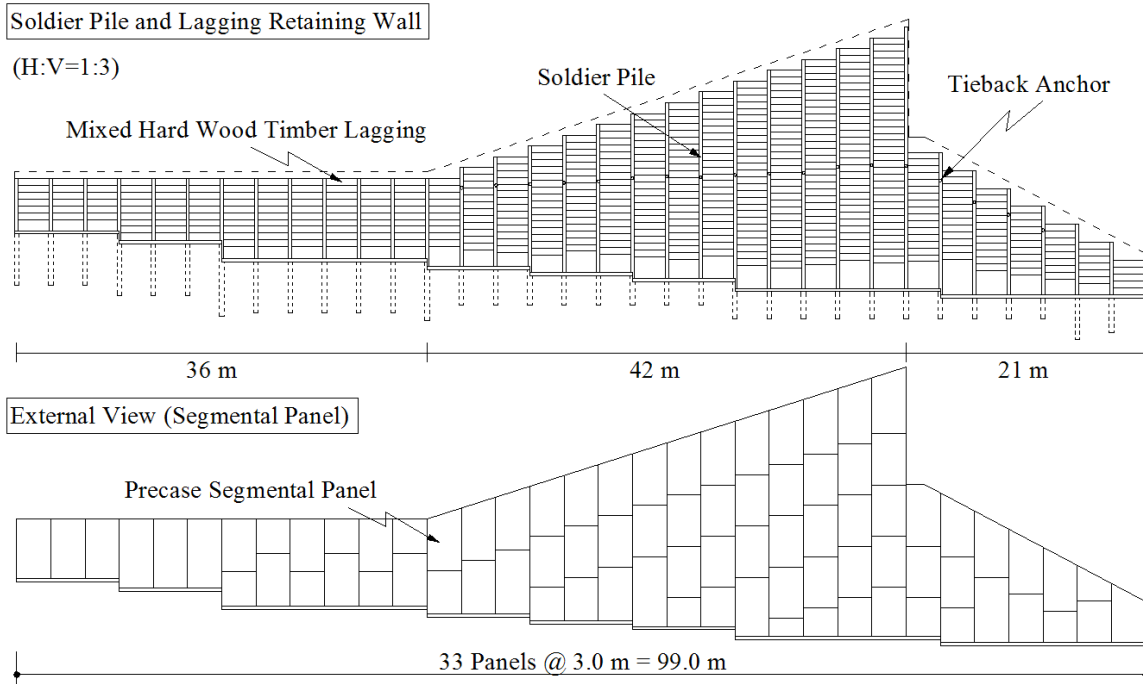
Geometry of US70/I85 retaining wall (front view with sloped Face at H:V=1:3).
